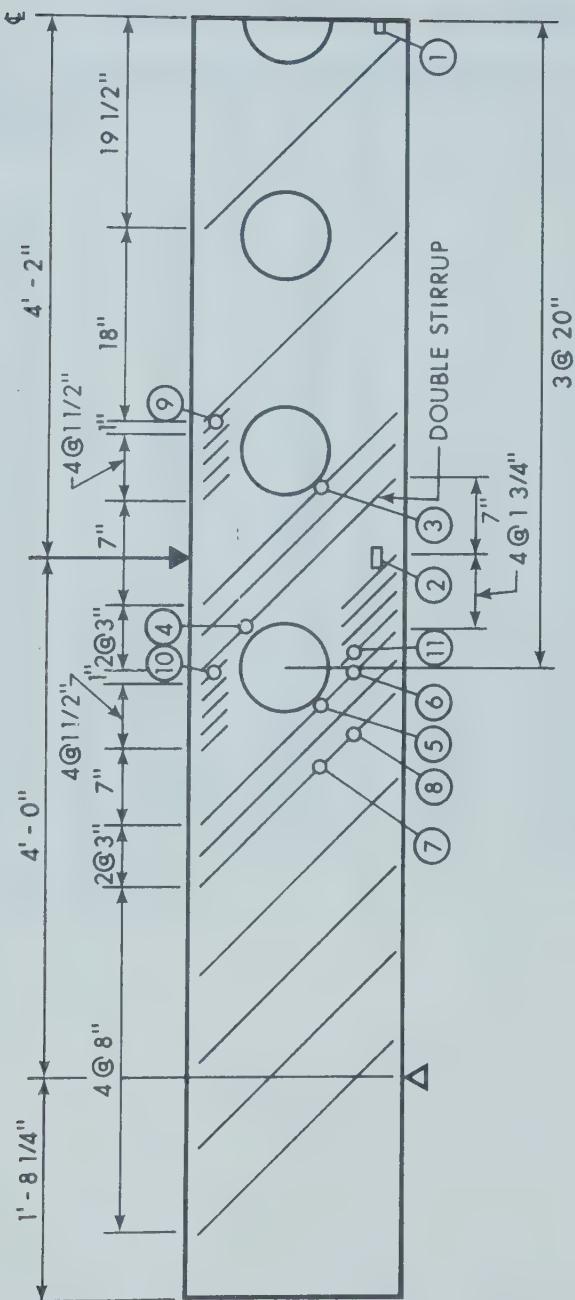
BEAM AD-8 REINFORCEMENT AND GAUGE DETAILS
